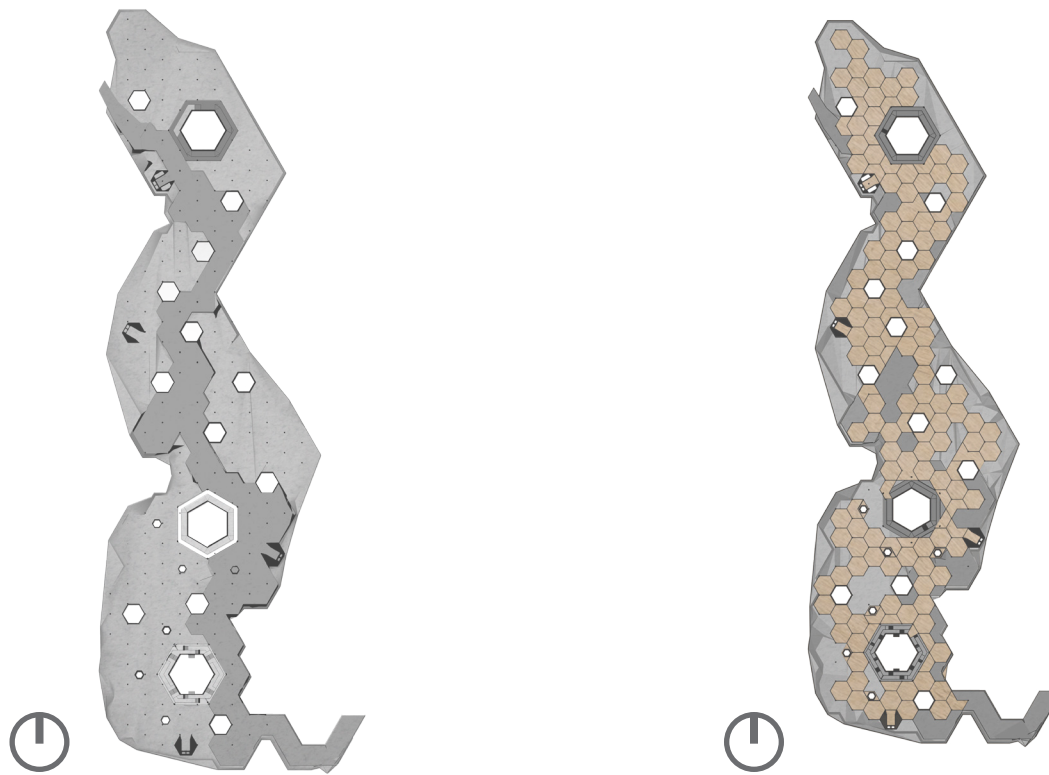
Level 1 plan showing public path (left) and Level 3 plan showing a typical growing floor (right).
